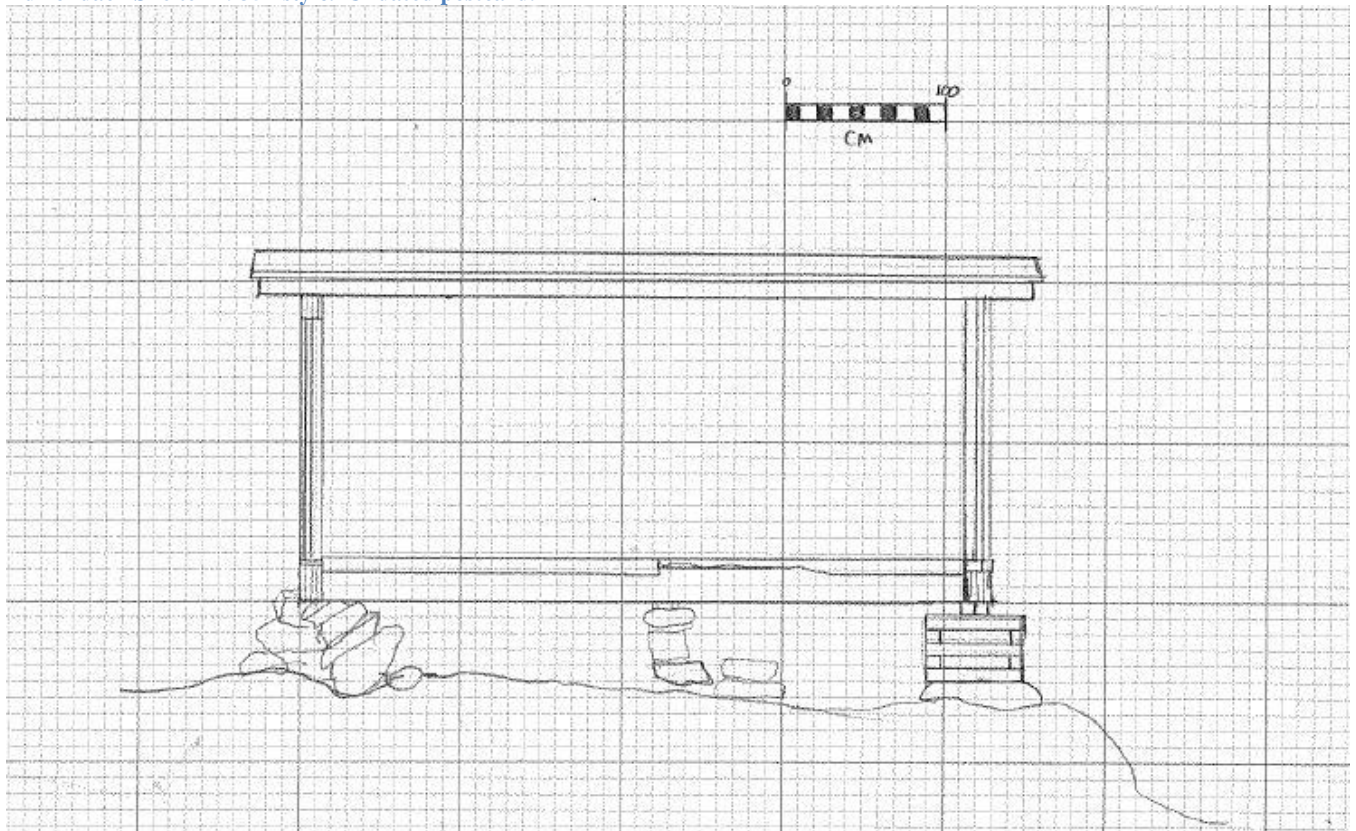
South Baldface shelter drawing. East (front) elevation. September 20, 2012.
